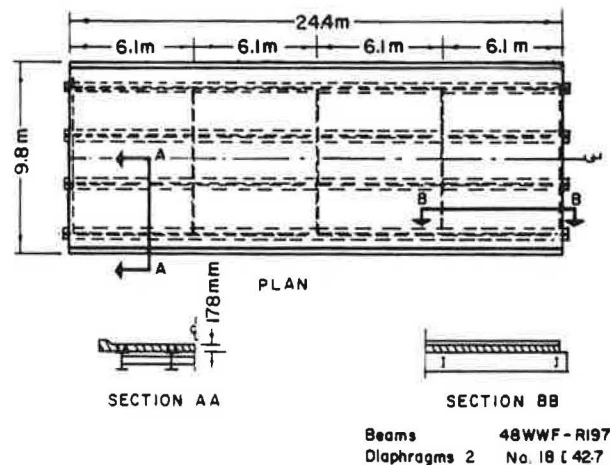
DESIGNATION OF BRIDGE PANELS.
